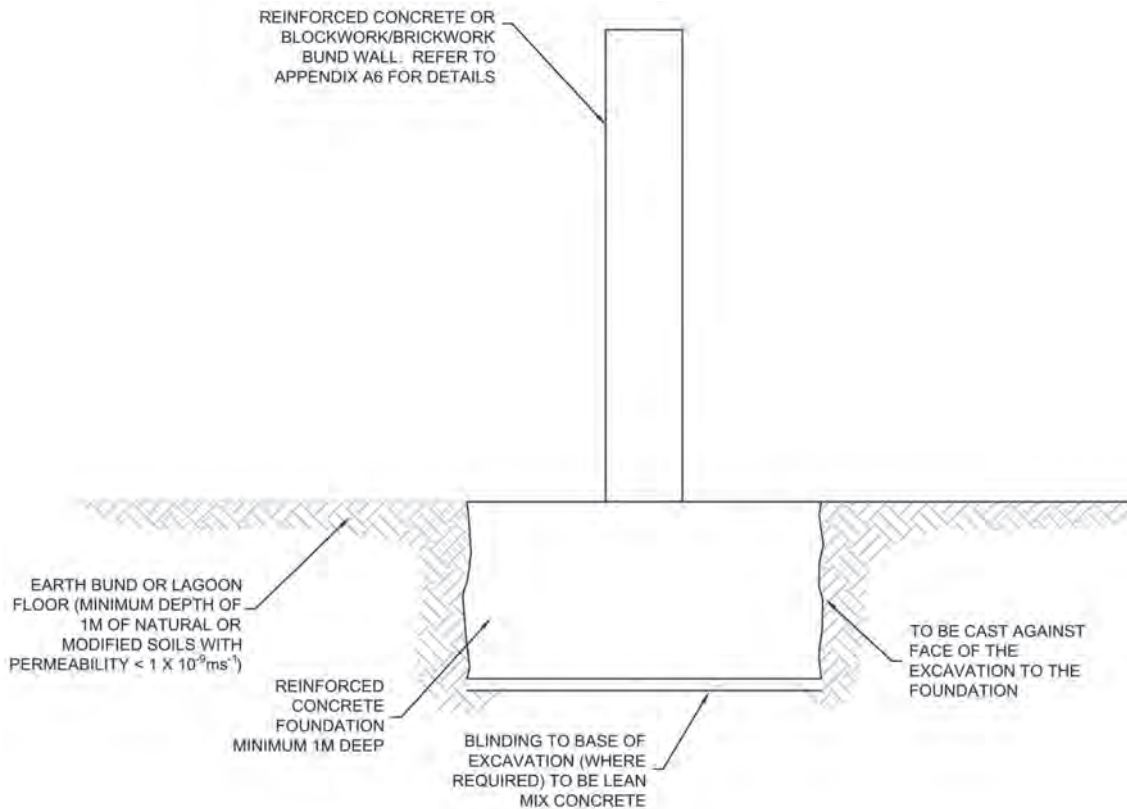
Foundation detail for in situ reinforced concrete or blockwork/brickwork bund wall with earth floor
